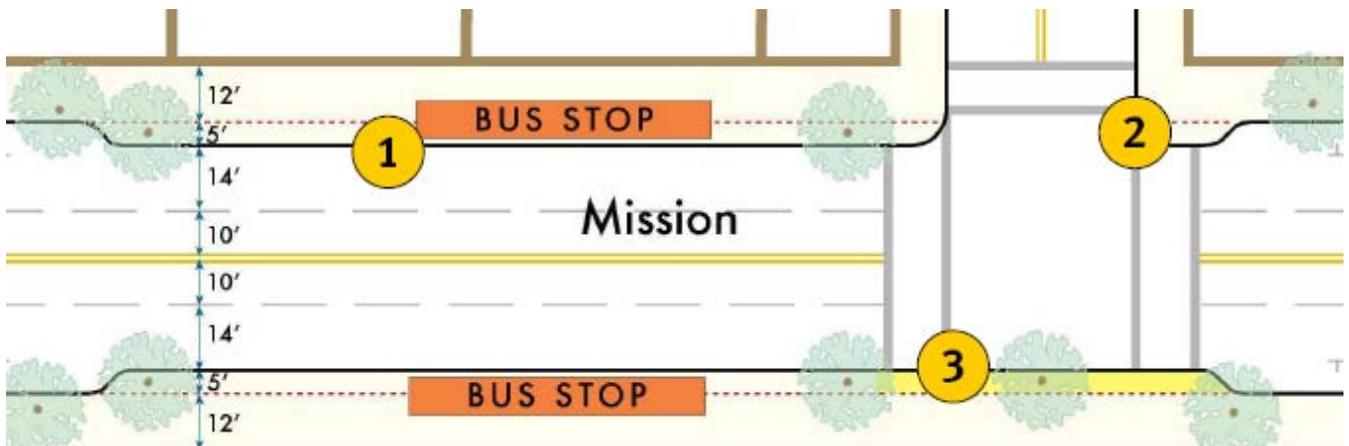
Typical improvements recommended for Mission Street intersections with Silver Avenue, Santa Rosa Avenue, and Onondaga Avenue.
